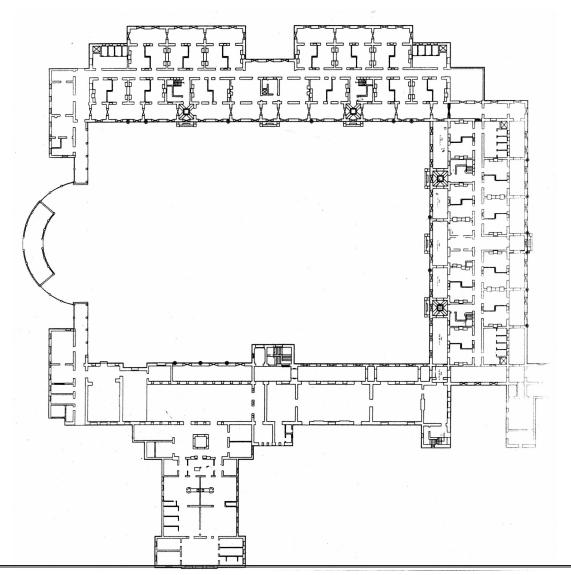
(g): Layout plan of MH Hostel Old Block: Ground Floor
